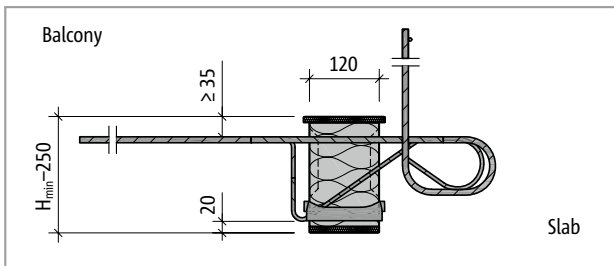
Schöck Isokorb® XT type K-WO: Product section
